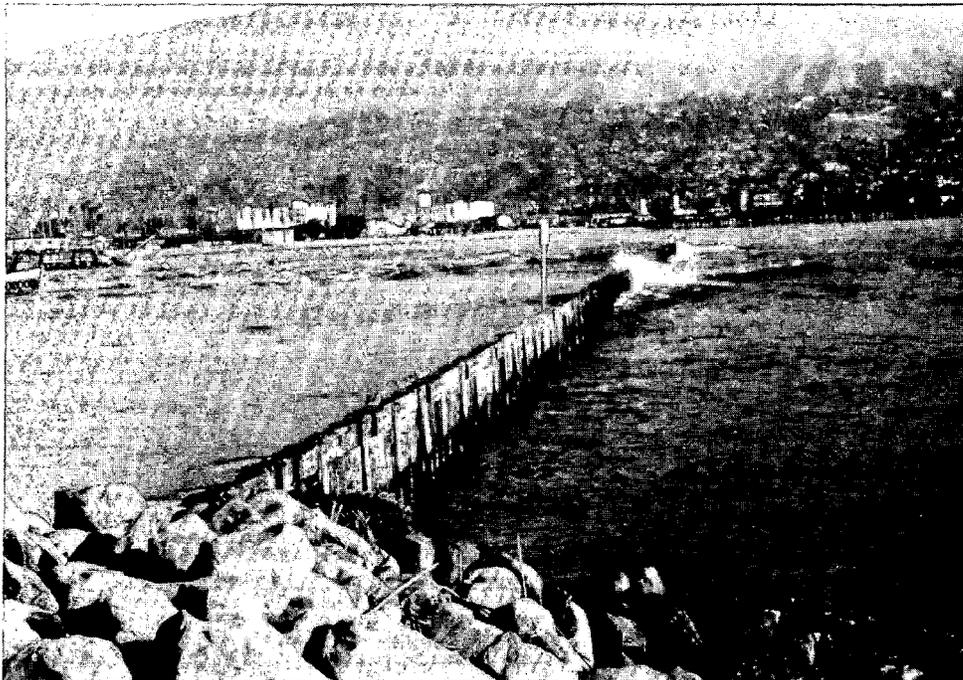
View looking north from the base of the timber sheet-pile structure that extends north from the Santa Barbara breakwater.
